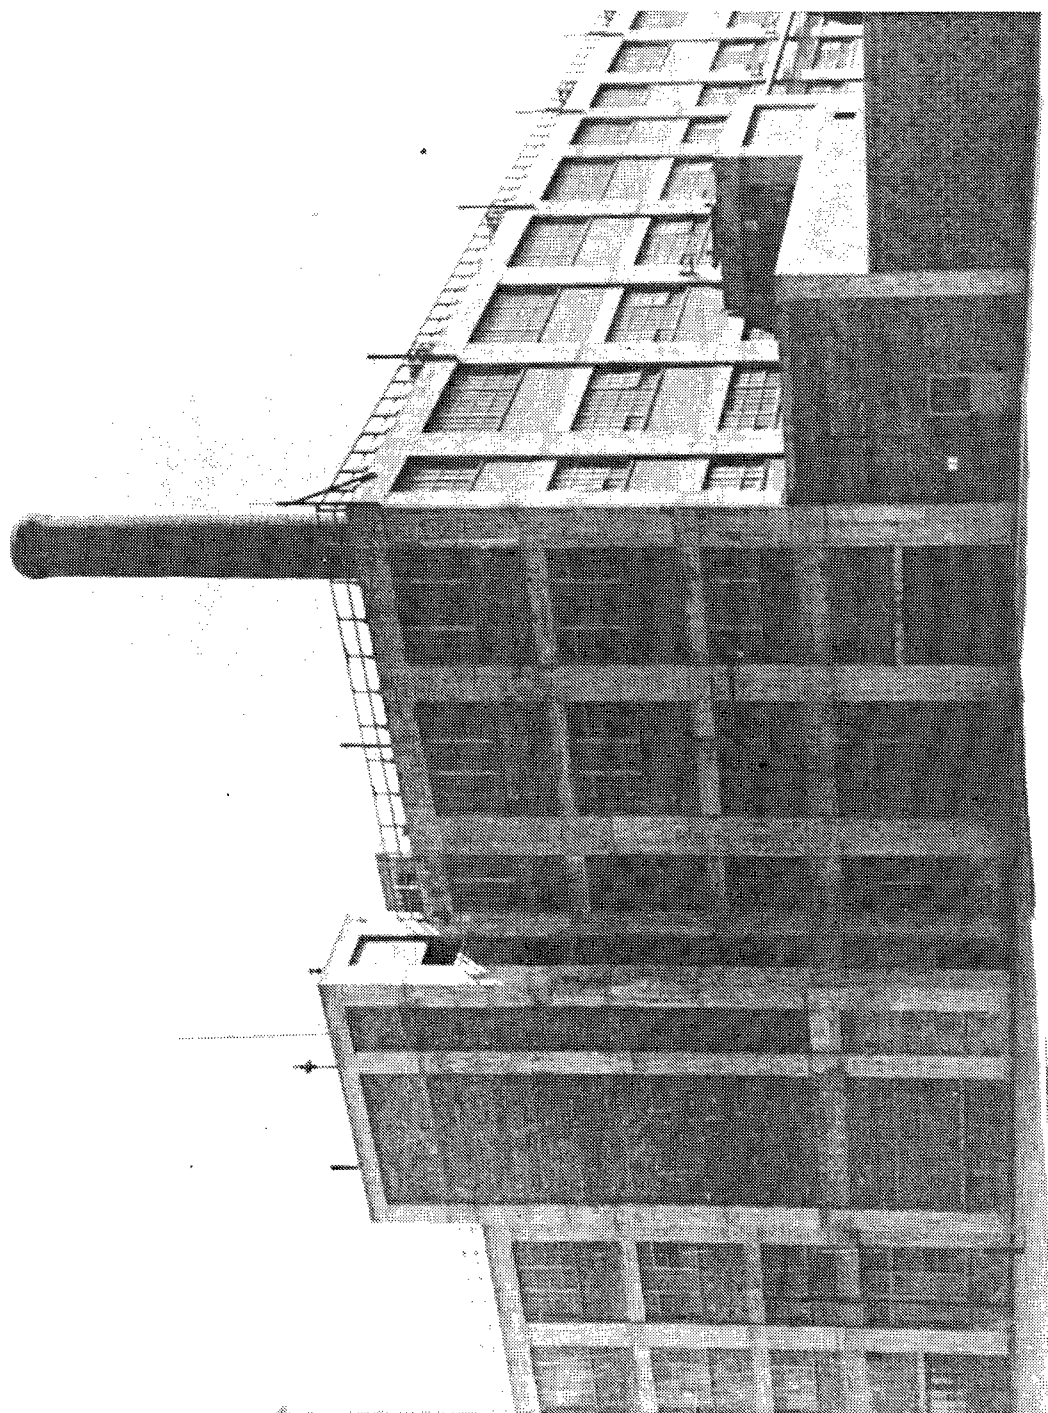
Anhydride Making, Building 7, Area A (courtesy of Holston AAP Photo Set No. 7 [on file Engineering Vault, Building 26]).
